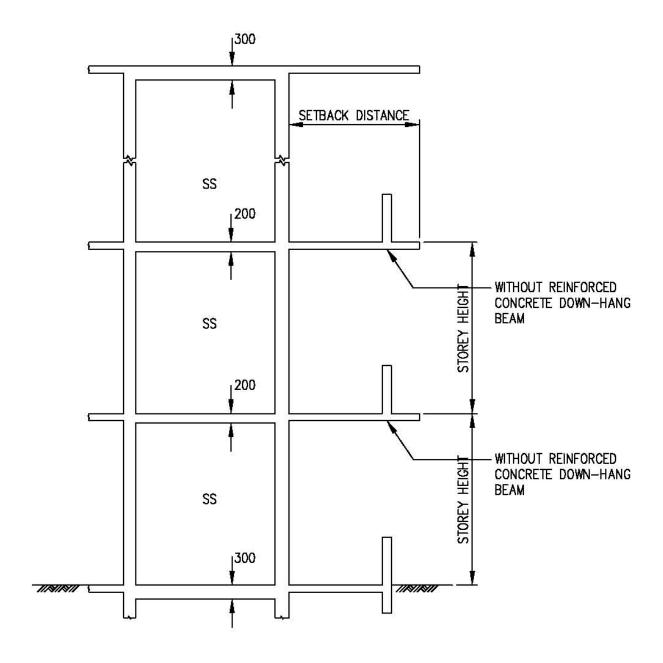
(c) REQUIREMENT ON SETBACK DISTANCE OF SS WALLS (WITHOUT DOWN-HANG BEAM)
